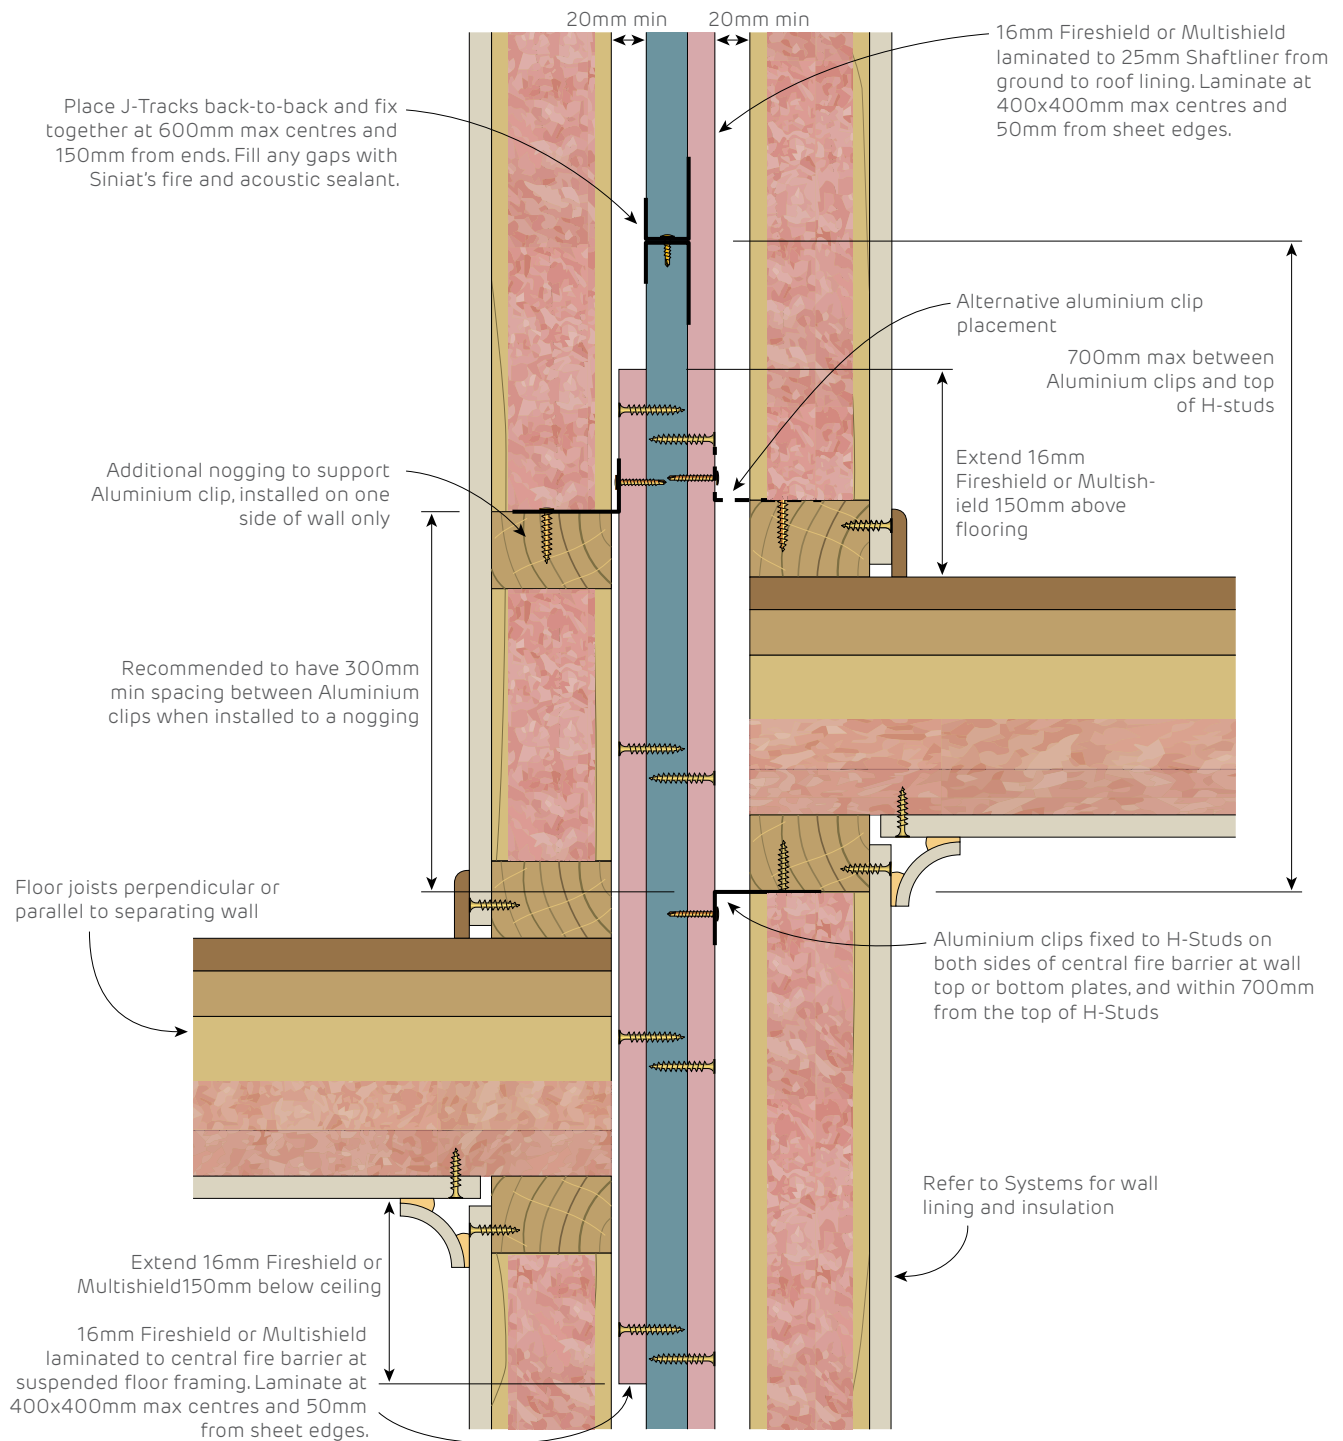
Interhome Wall to Upper Storey Staggered Floor with Additional Noggings Installed
